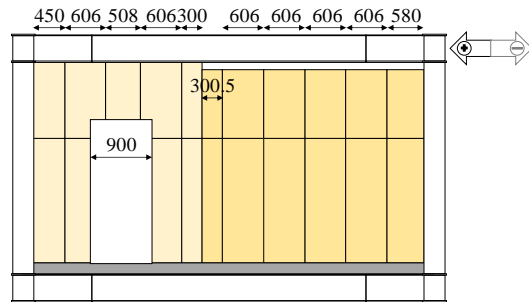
shows the configuration of the ALC wall. Similar with the LGS frame, the configuration of the ALC wall is designed to be different in both frames to consider some typical configurations for the exterior wall type. As shown in the figures, the E-frame wall has no openings, while the W-frame wall has two openings for a door and a window.
